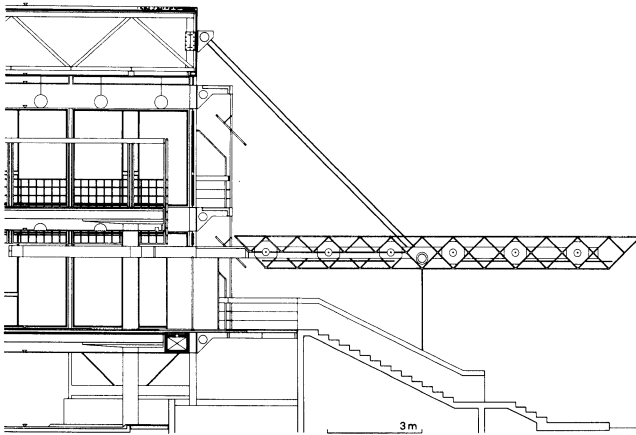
Egon Eiermann, Office Building and Training Center for the German Olivetti Company, Frankfurt am Main, 1968–1972. Section of the low-rise building and the canopy of a constructive skeleton consisting of a long stretched steel frame, which reaches into the interior of the building. The inner part of this frame forms a counterweight to the protruding outer part, which is suspended from steel cables (The Architectural Collection of the University of Karlsruhe).
